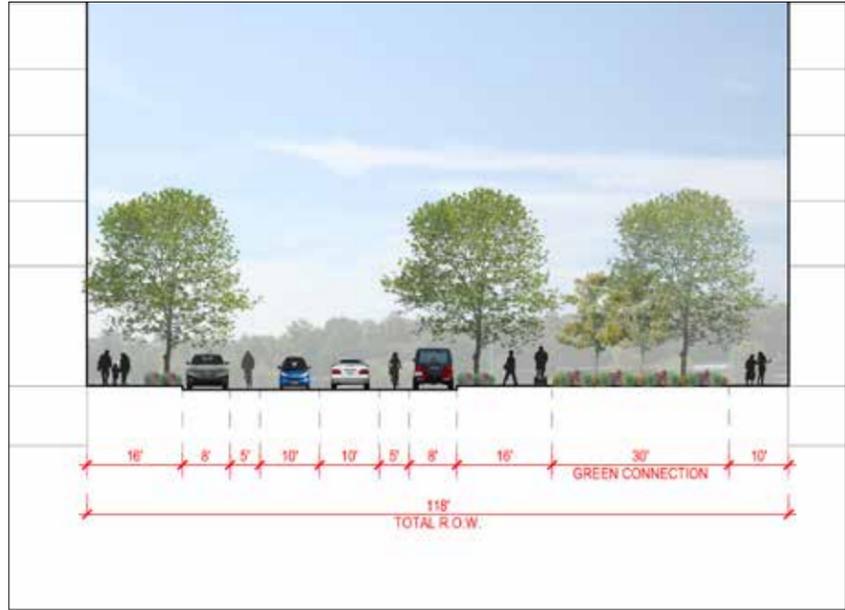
Cross section through typical "C" street with bike lanes and green connections
